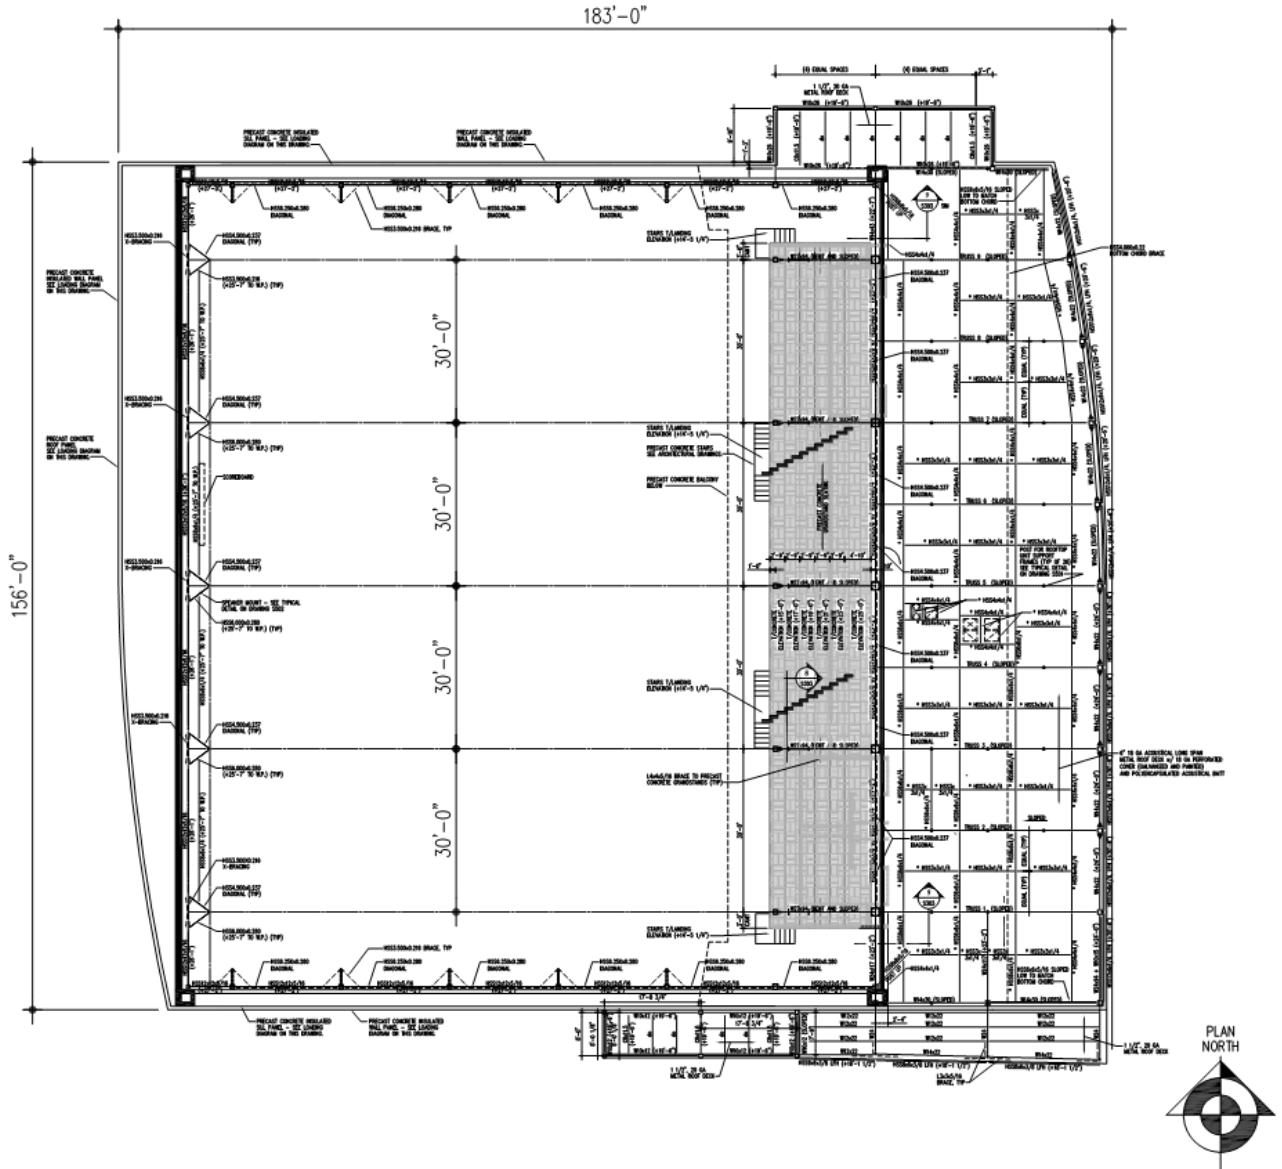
Gallery/Mezzanine Level Framing Plan (the shaded portion is the grandstand seating area)
